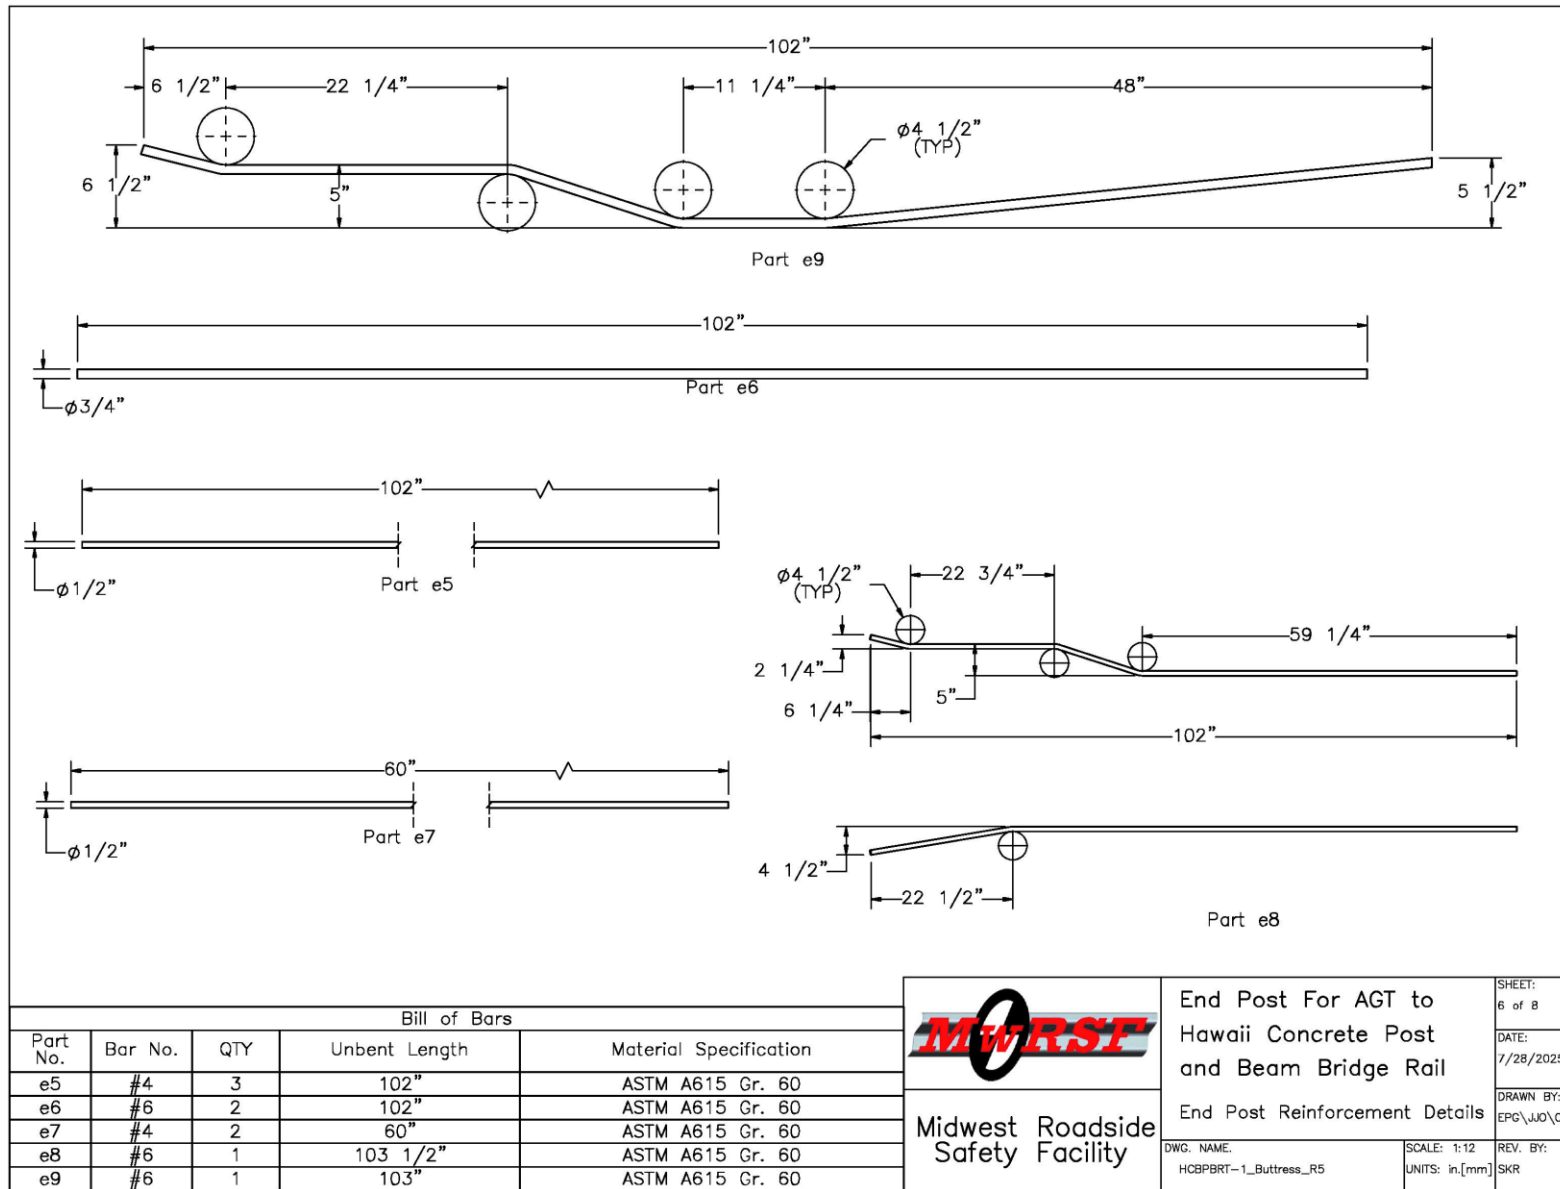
Bridge Rail End Post, Longitudinal Rebar Details
